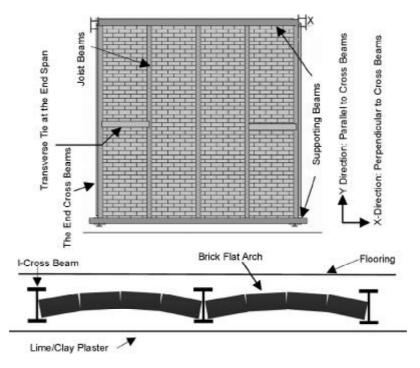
Geometry of the roof and its elements: the X direction is parallel to the supporting beams and perpendicular to the I-cross beams.
